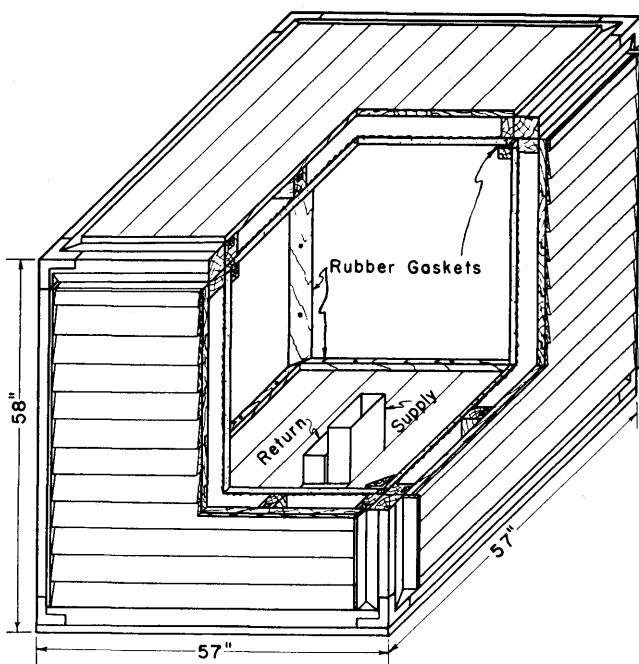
SECTIONAL VIEW OF TEST HOUSES SHOWING DETAILS OF CONSTRUCTION
